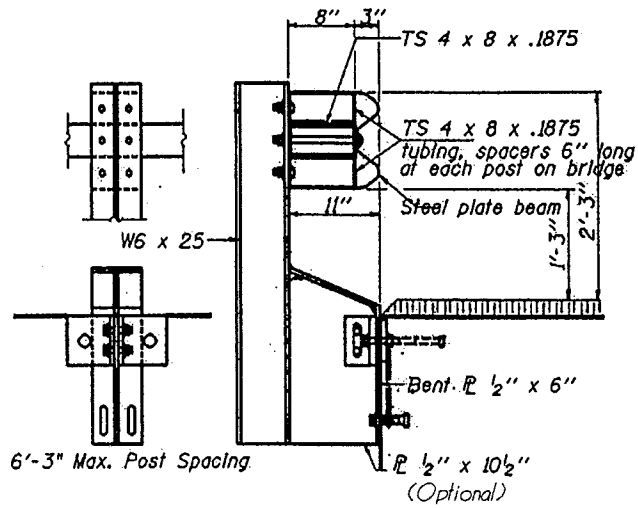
Ohio Box Beam Bridge Railing Cross-Section
